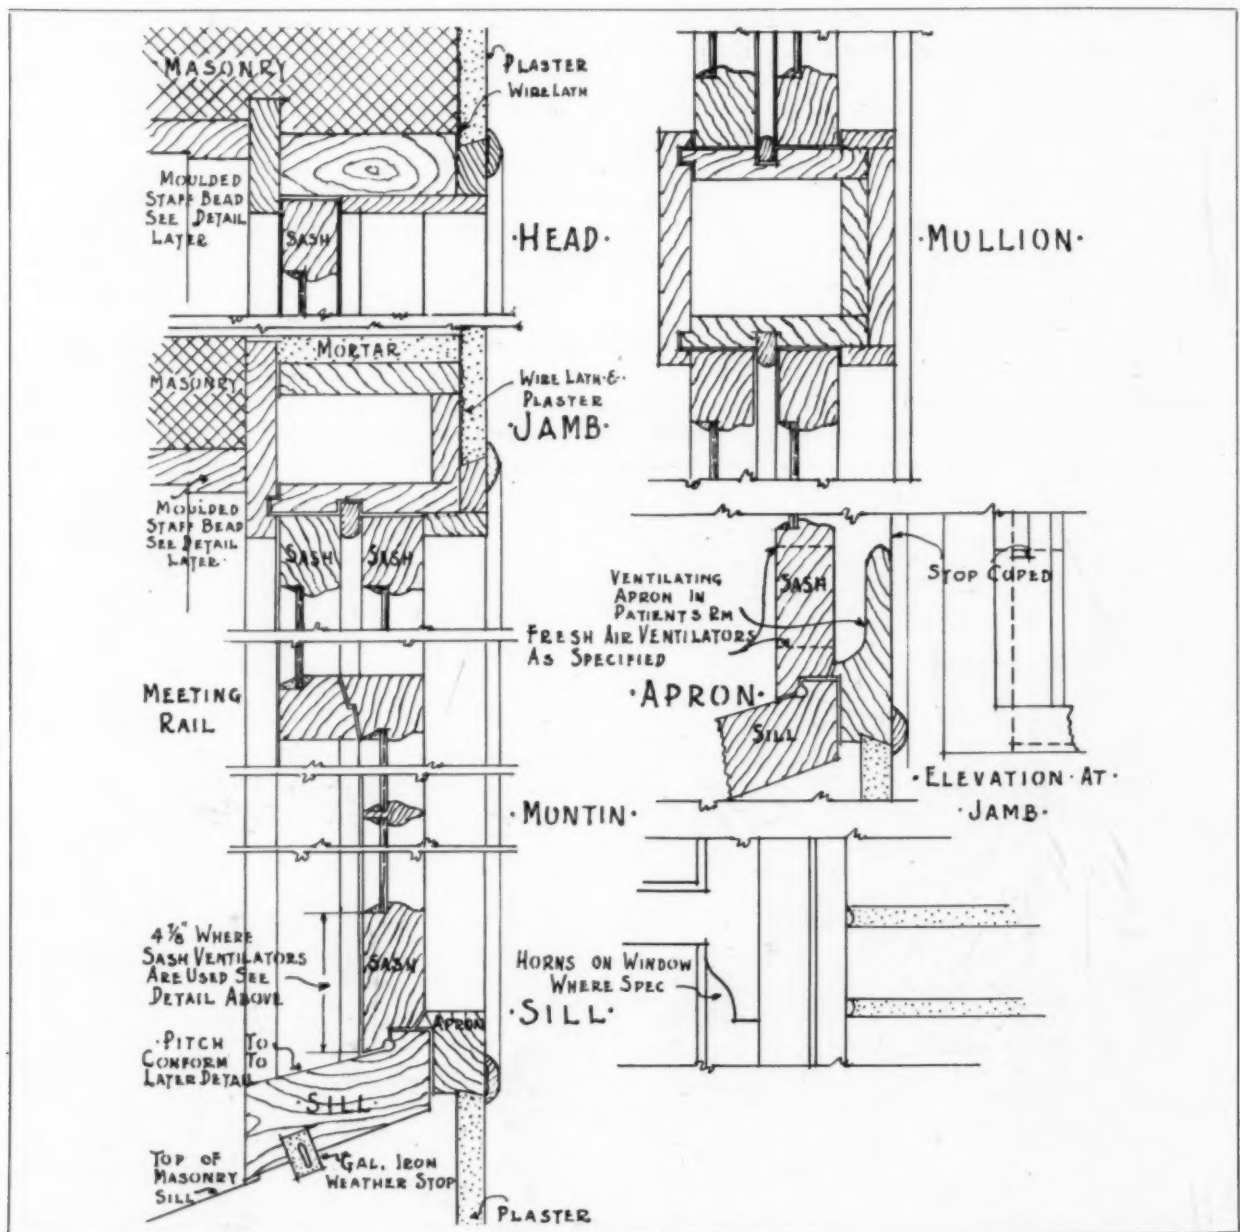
Detail of Typical Double Hung Window, Showing Ventilating Apron and Simple Method of Finish Against Plastered Wall
